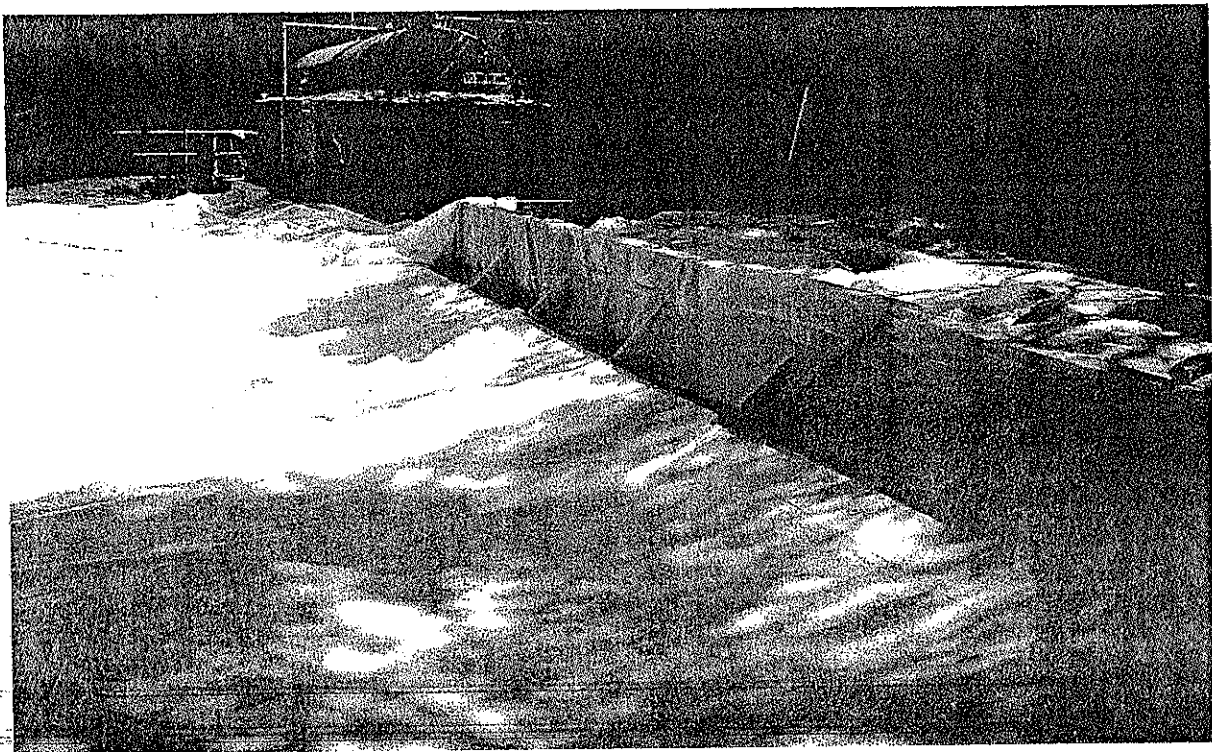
Test Pit (C-10) Located Ninety Feet North from Test Pit (C-8)
